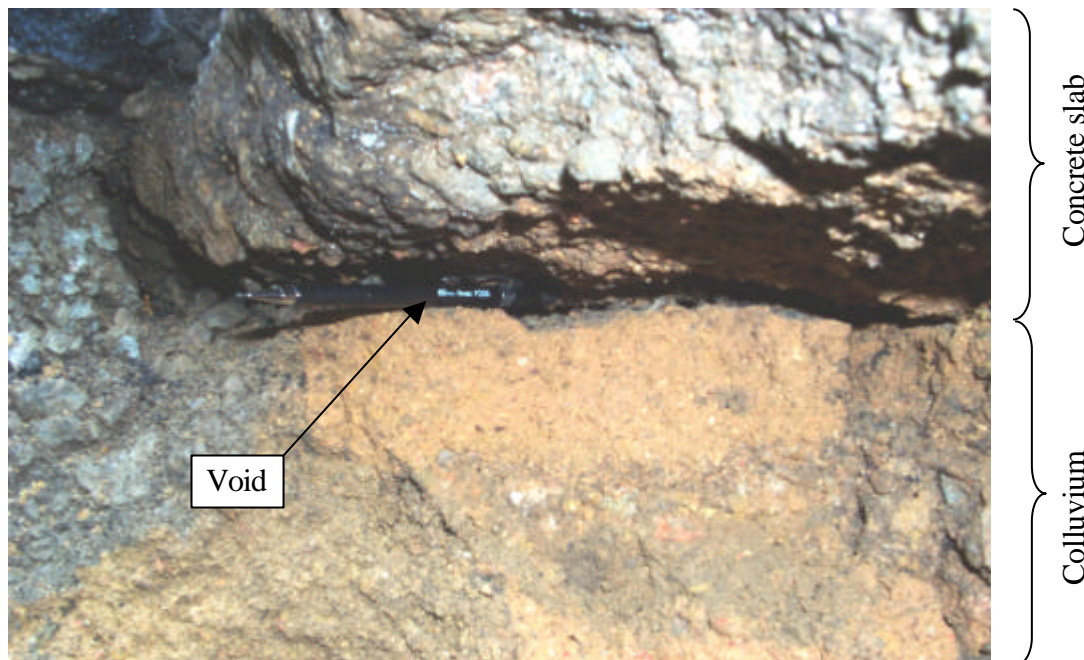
View of Void between Sub-grade and Underside of Concrete Road Pavement in Trial Pit No. TP2
